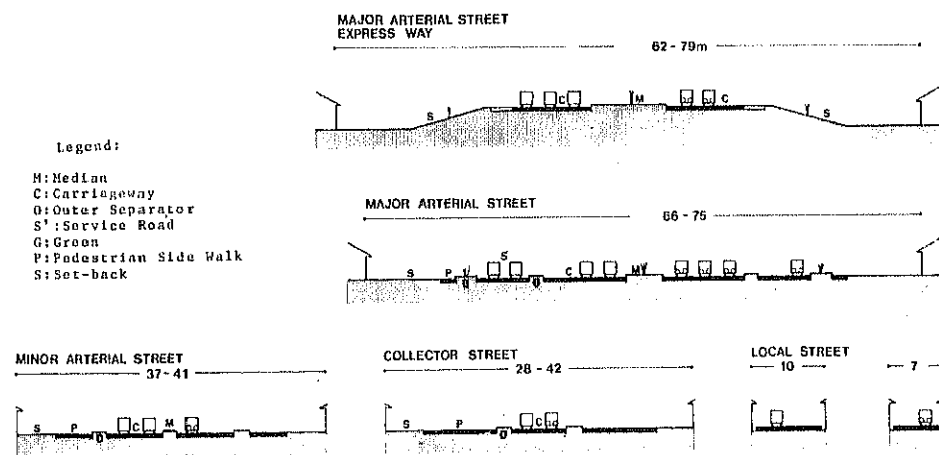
TYPICAL CROSS SECTION OF SECONDARY SYSTEM
